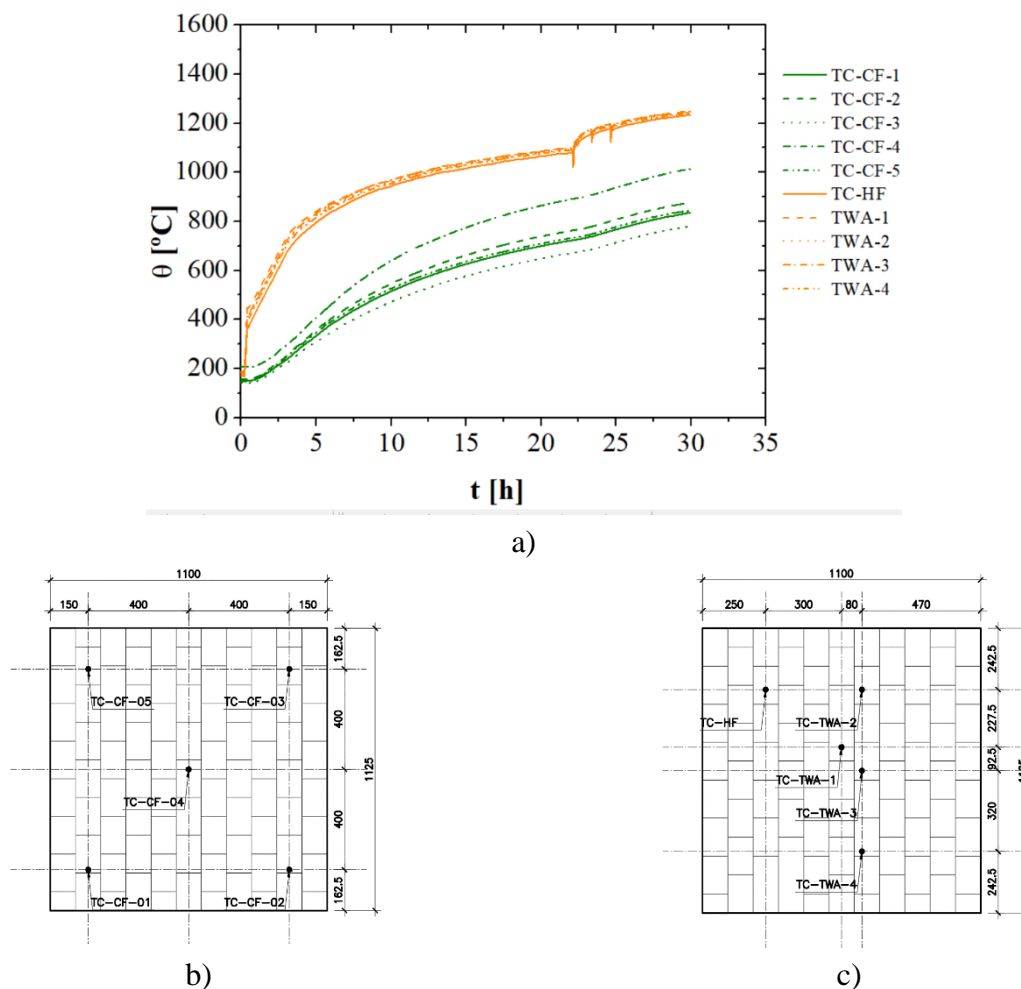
Test series S09.HT.CBJ – Preliminary test: a) Temperatures; b) Thermocouples of the cold face; c) Thermocouples of the hot face
